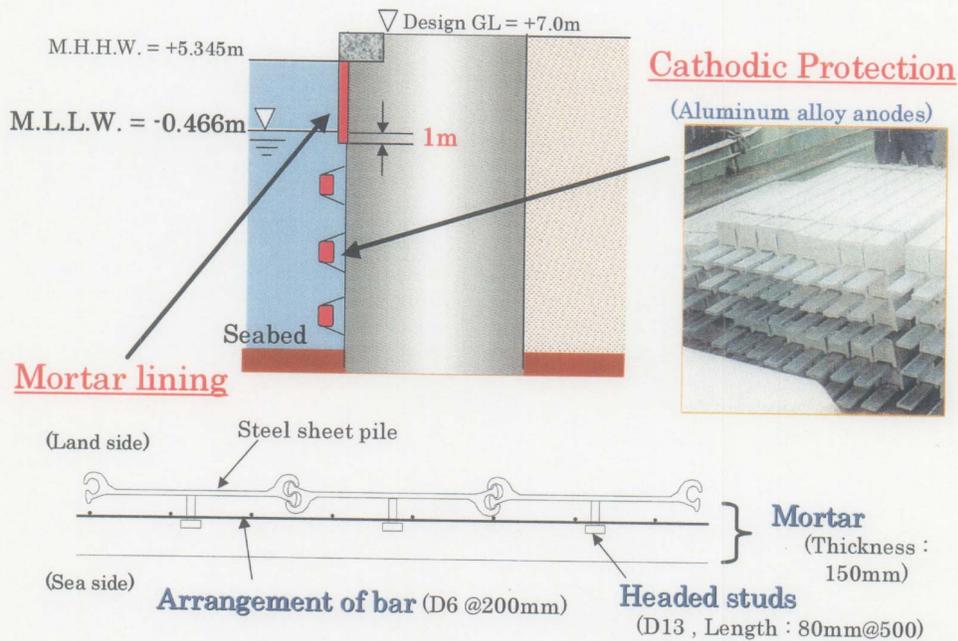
Anti-corrosion for Steel Sheet Pile
